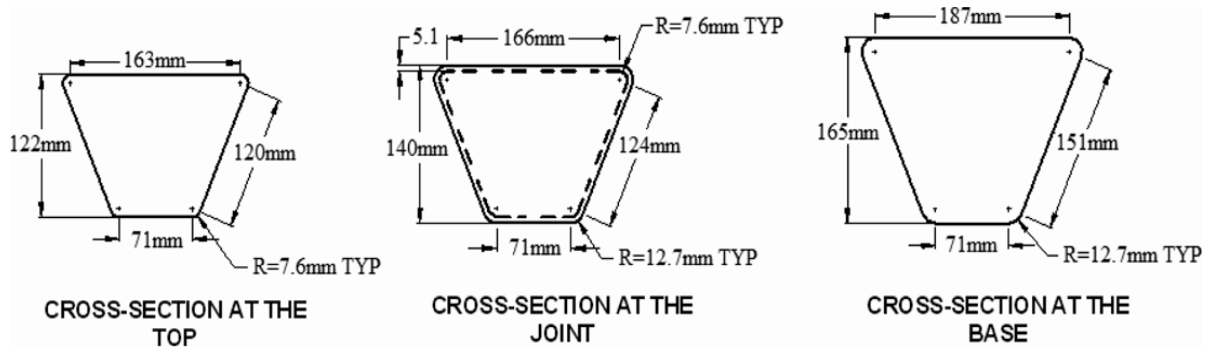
Single-cell cross-sectional details (Polyzois et al. 2009)
